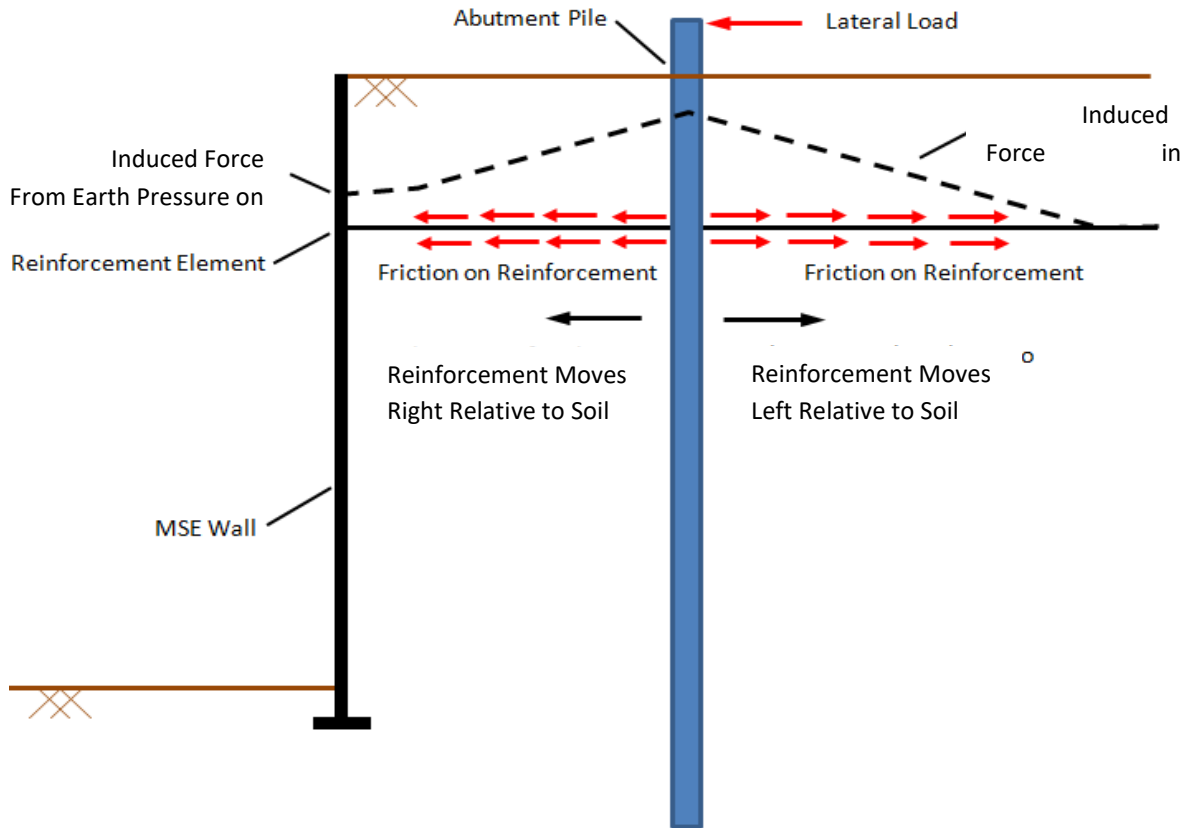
Interaction of soil and MSE wall reinforcement when pile is laterally loaded.
